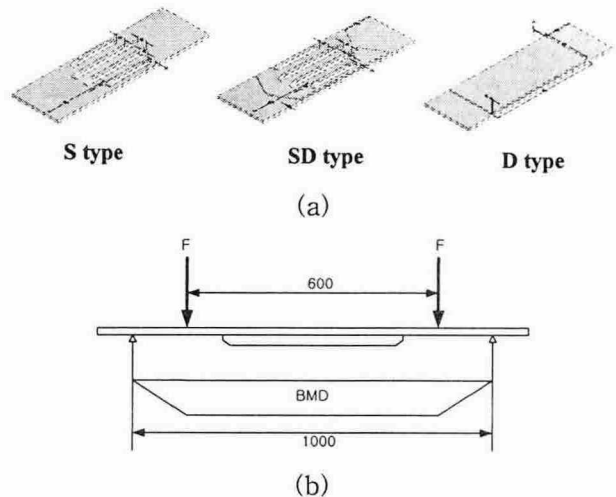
(a) Configurations of test specimens, (b) 4-point bending fatigue test method
